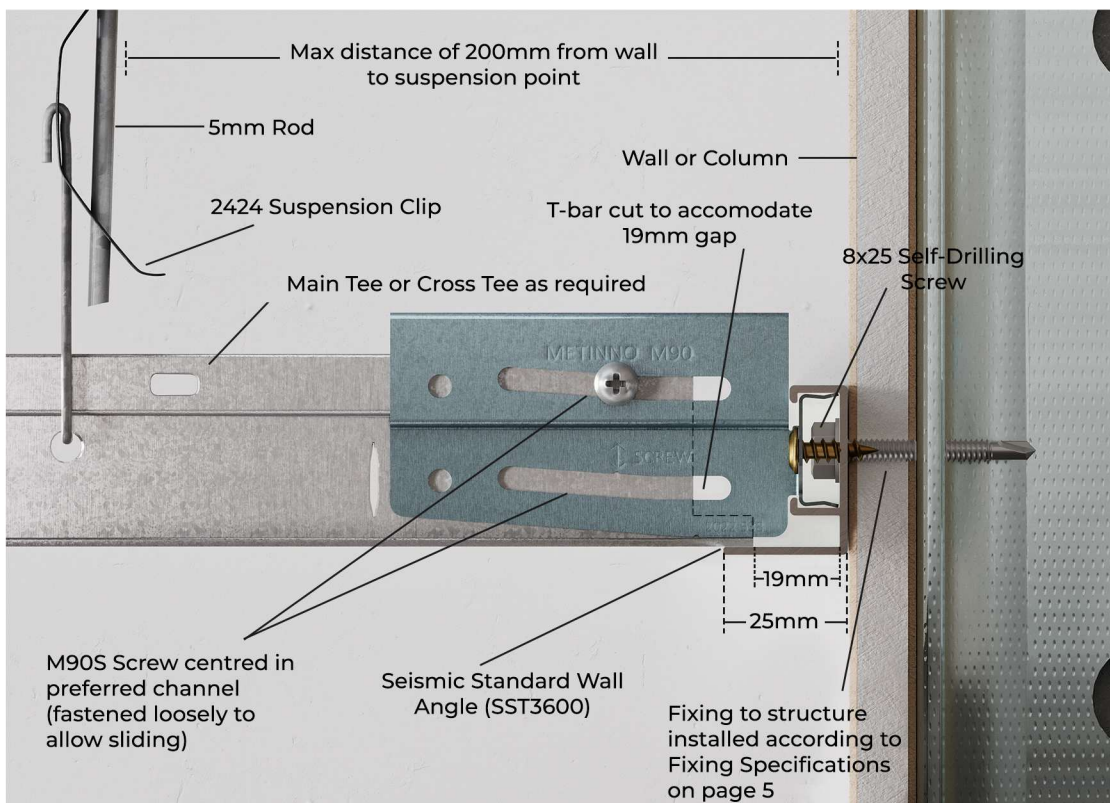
Floating Ceiling-Wall Connection with M90 Clips
